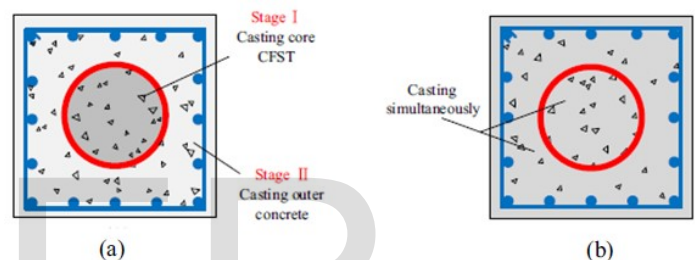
Typical Concrete-encased CFST column. (a) Staged construction (b) Non-staged construction
